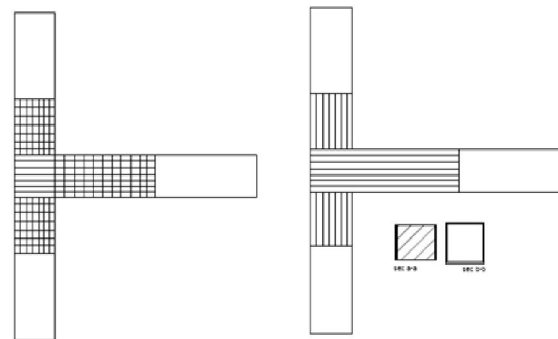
The specimen of strengthened external joints E₂₂-E₃₃, before and after beam and column wrapping
